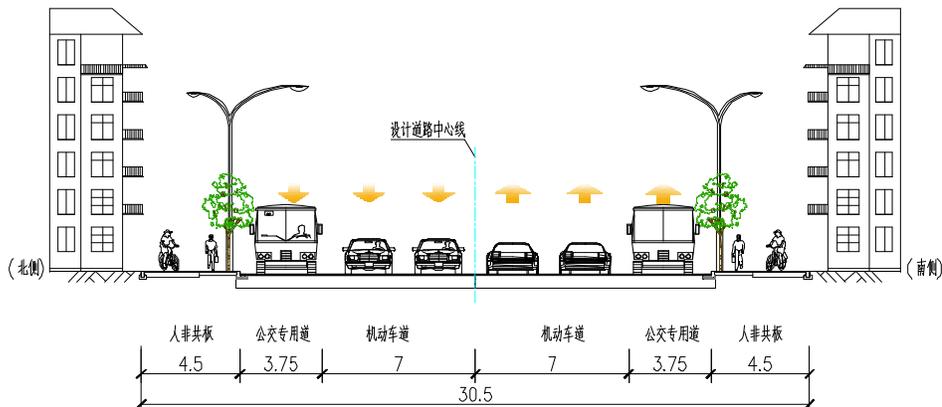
Profile design for Zhangqian Road□Changxing Road
